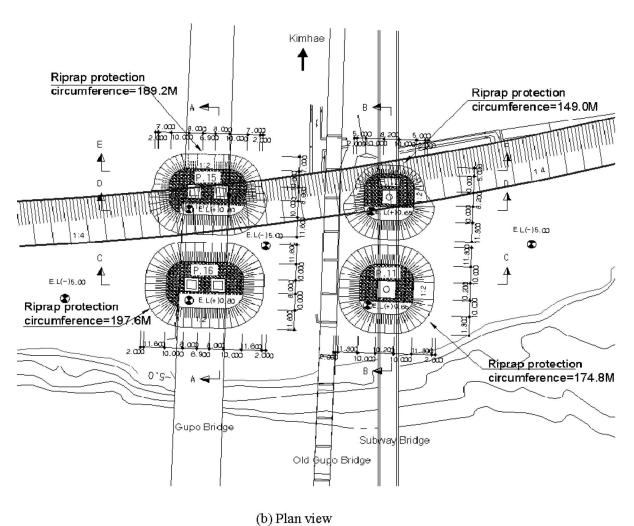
Implementation design drawing for modified Plan III (Source: Limkwang Engineering & Construction 2007)
